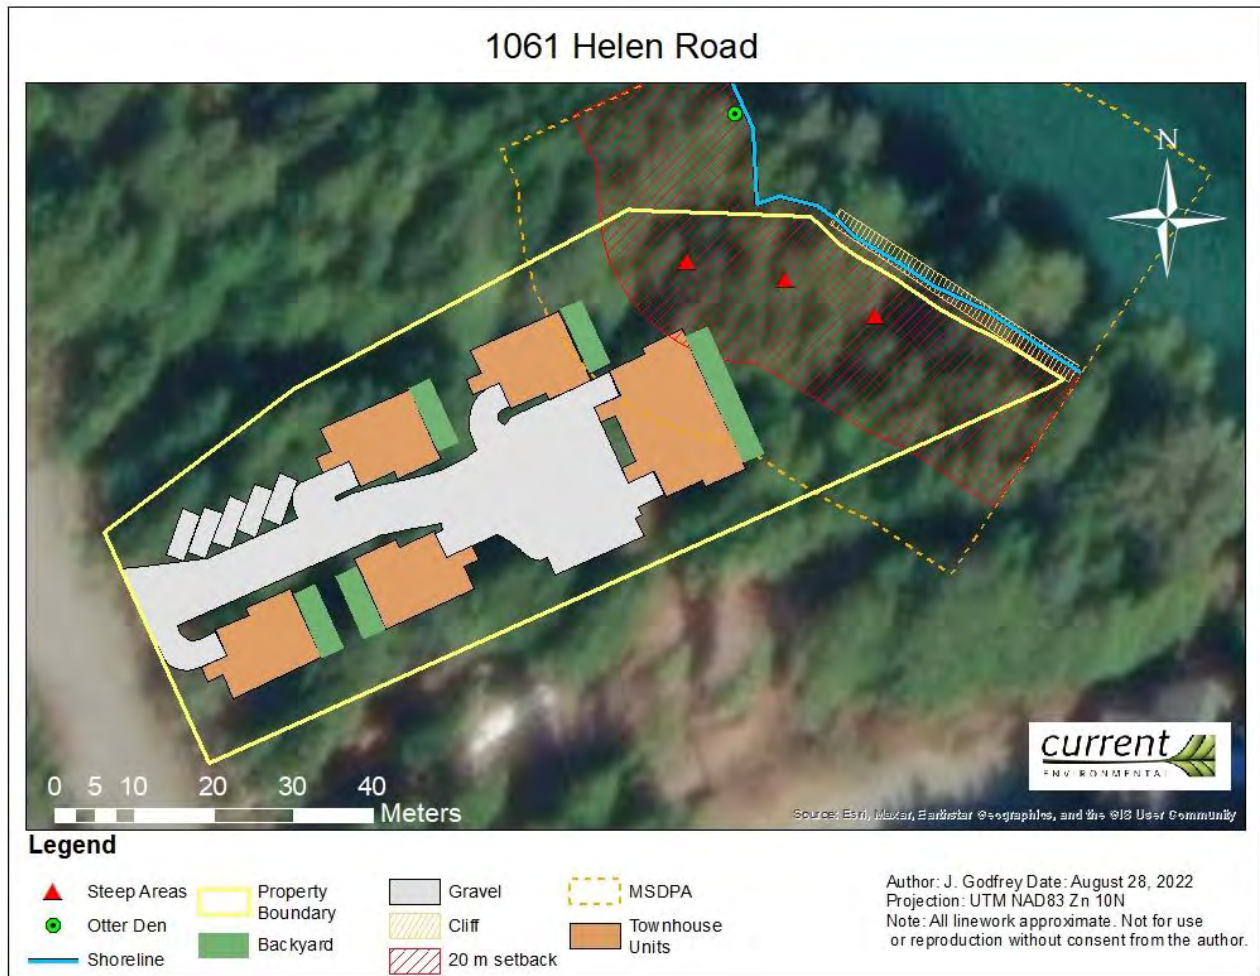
Location of the proposed development in relation to the 30 m MSDPA and 20 m Shoreline setback
